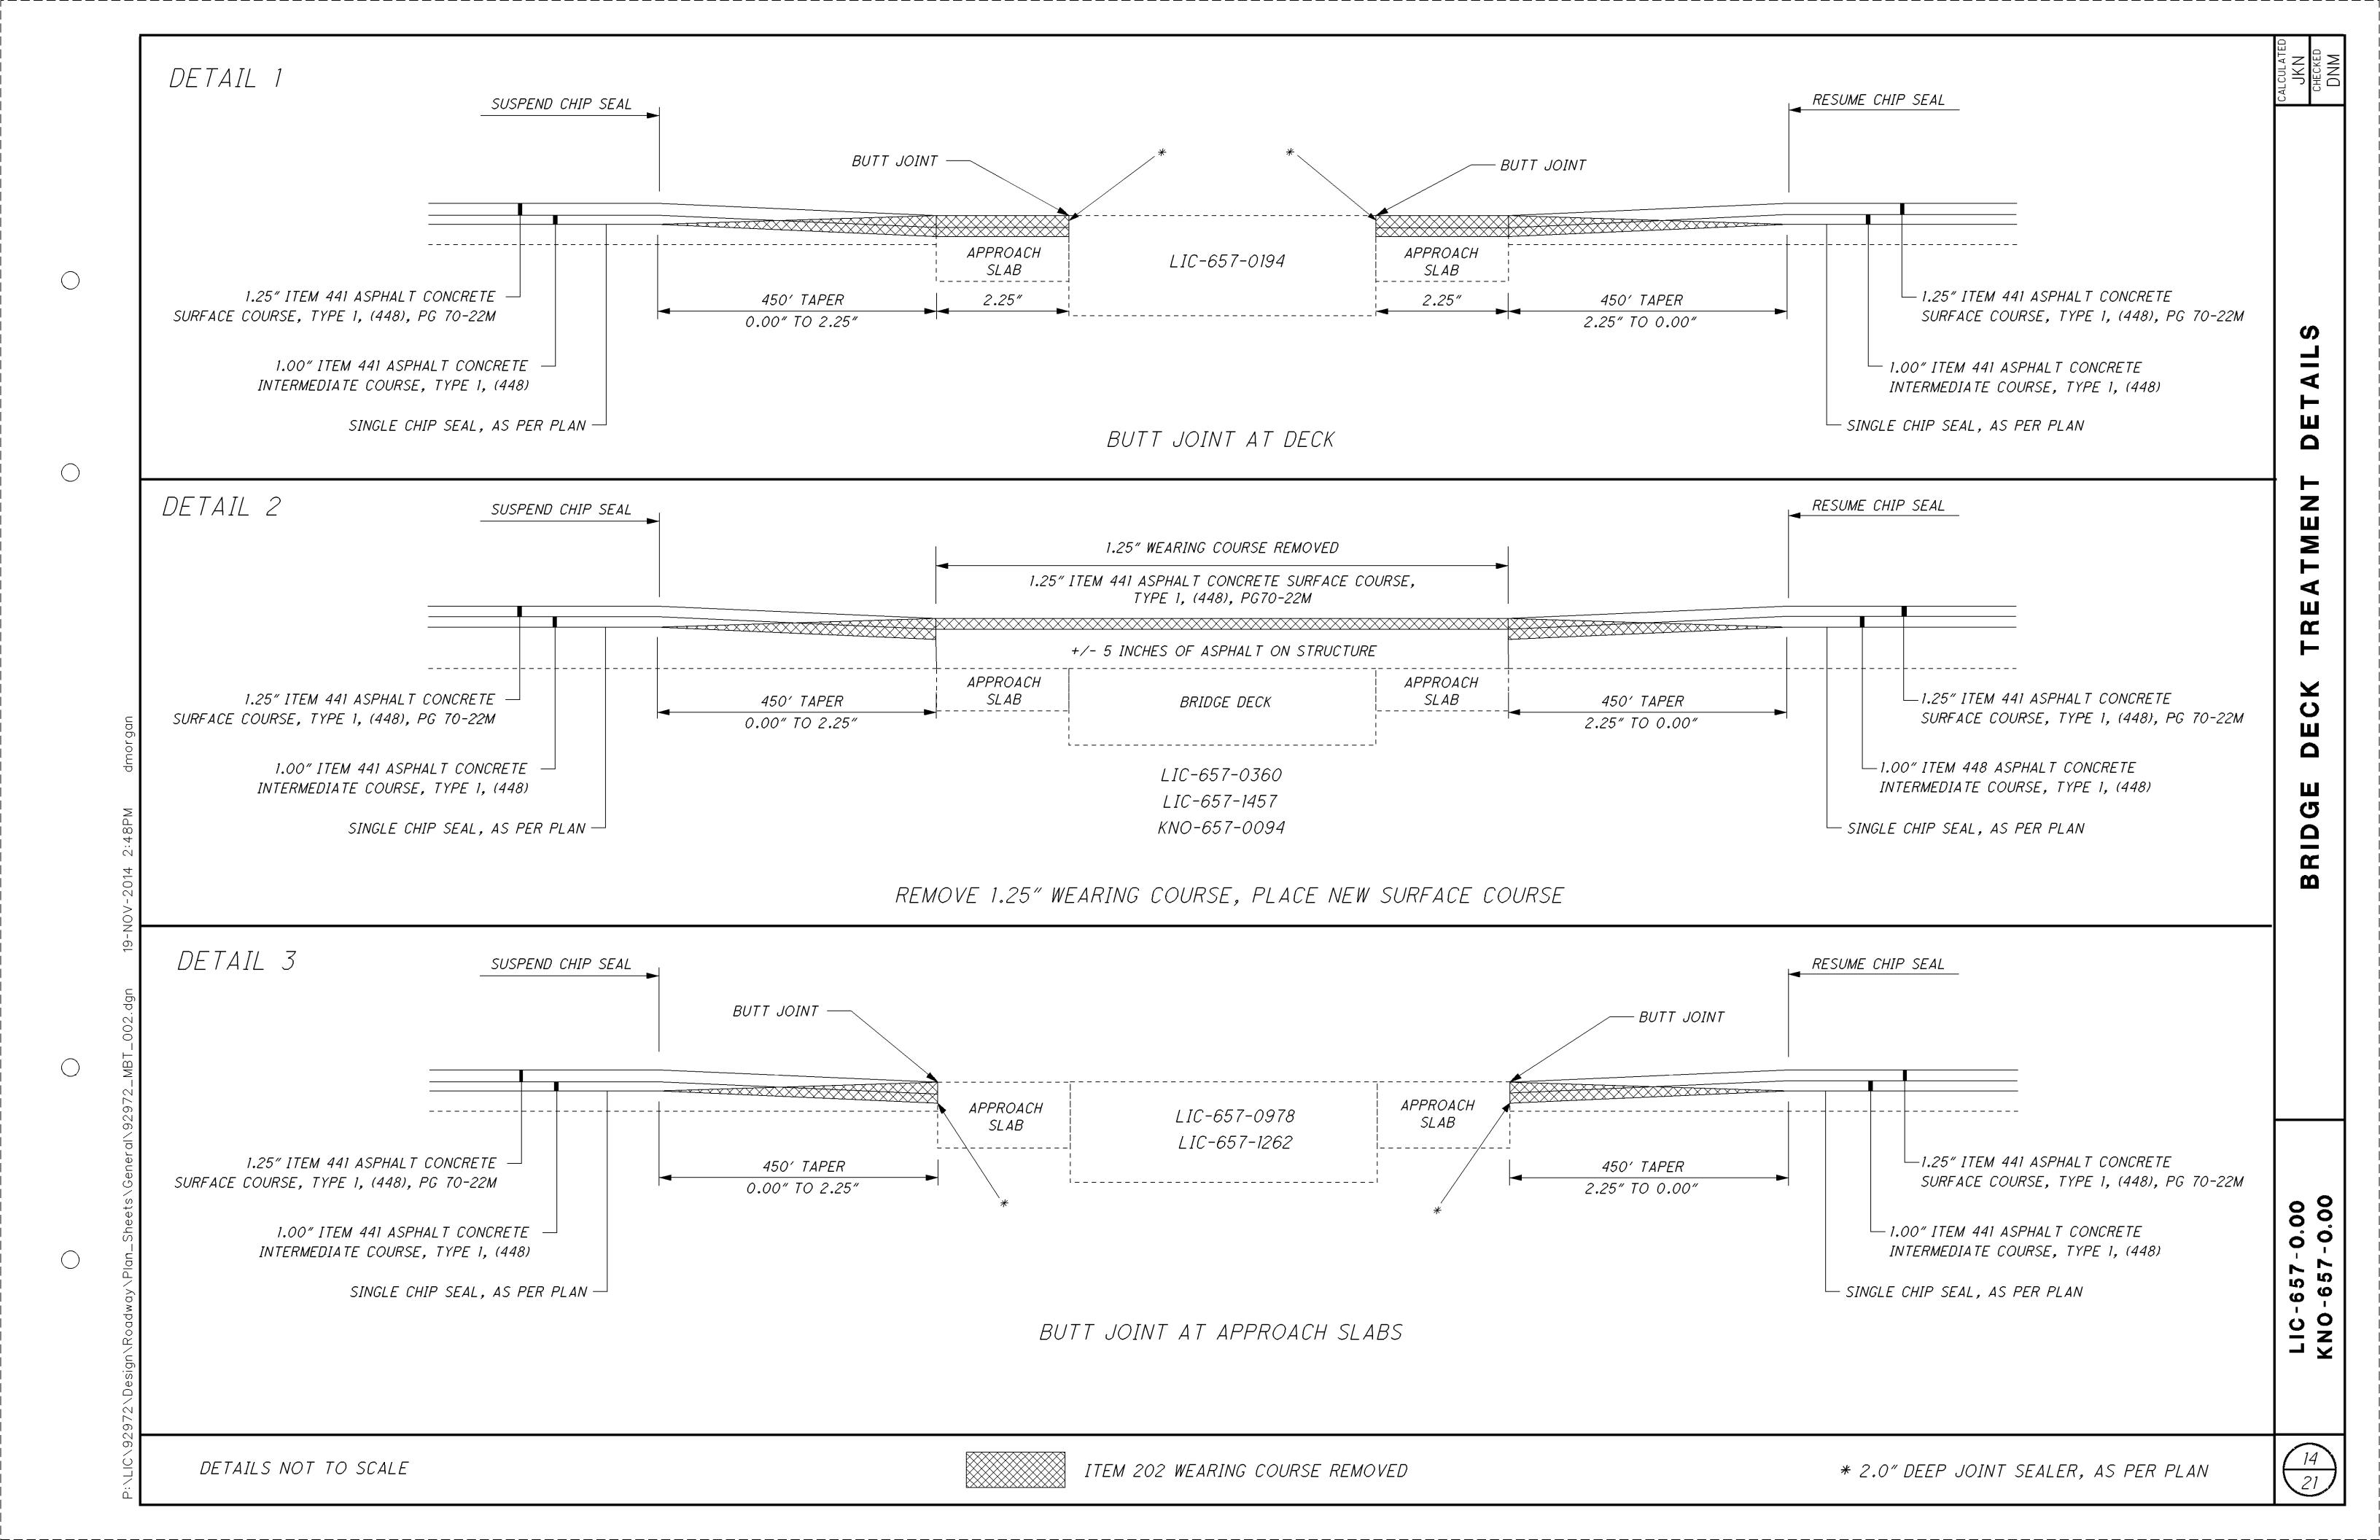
LIC-657-0360: REMOVE 1.25" WEARING COURSE, PLACE NEW SURFACE COURSE DETAIL (3) LIC-657-0978: BUTT JOINT AT APPROACH SLABS DETAIL (3) LIC-657-1262: BUTT JOINT AT APPROACH SLABS DETAIL (2) LIC-657-1457: REMOVE 1.25" WEARING COURSE, PLACE NEW SURFACE COURSE
